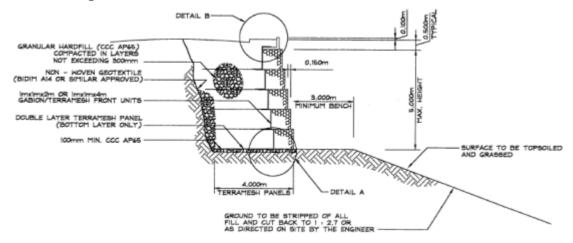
Typical mesh reinforced gabion wall detail (courtesy: geotech consulting limited)
